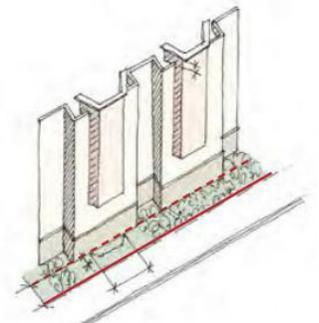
Bay Windows protecting over the setback line. They should be at least 6’ apart.
